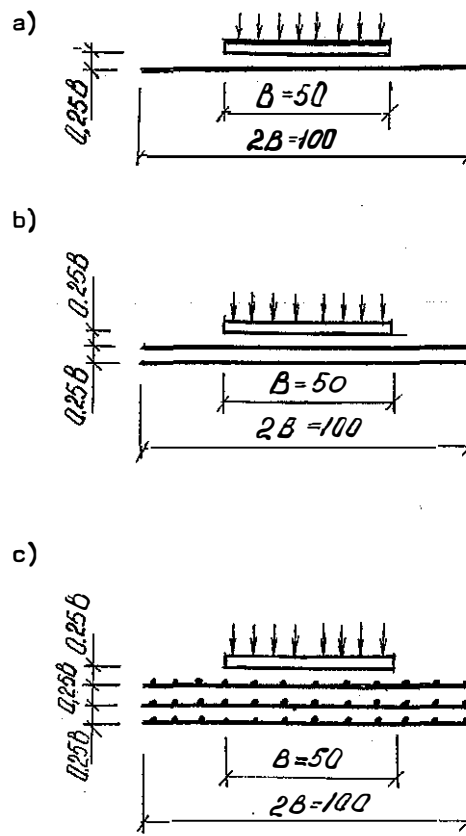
Diagram of reinforcement by strips and net reinforcement:
